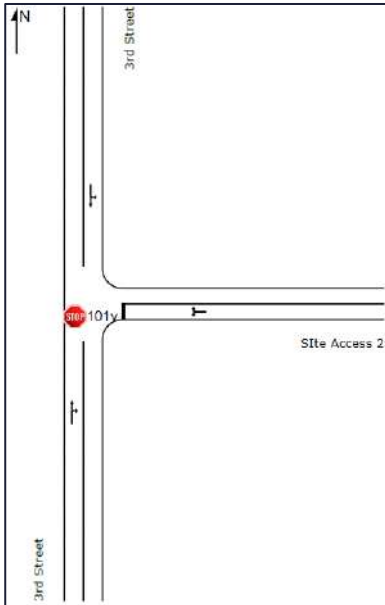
Proposed Intersection Layout: 3rd Street and Site Access 2
